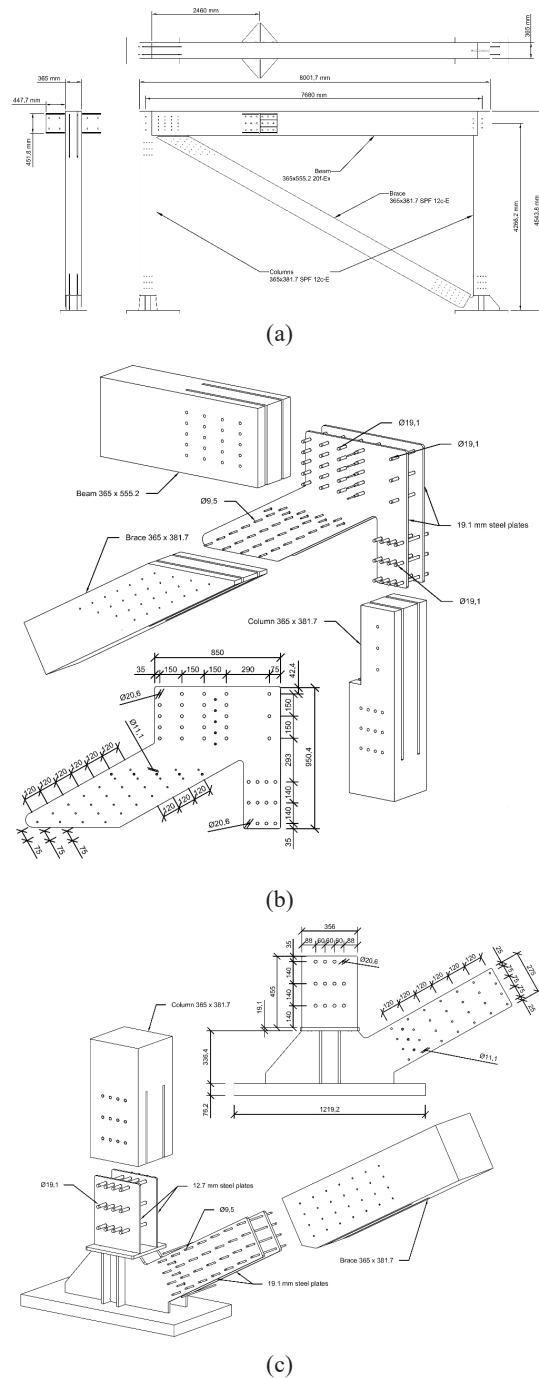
Specimen layout: full-scale wood frame (a), top brace connection (b) and bottom brace connection (c)
